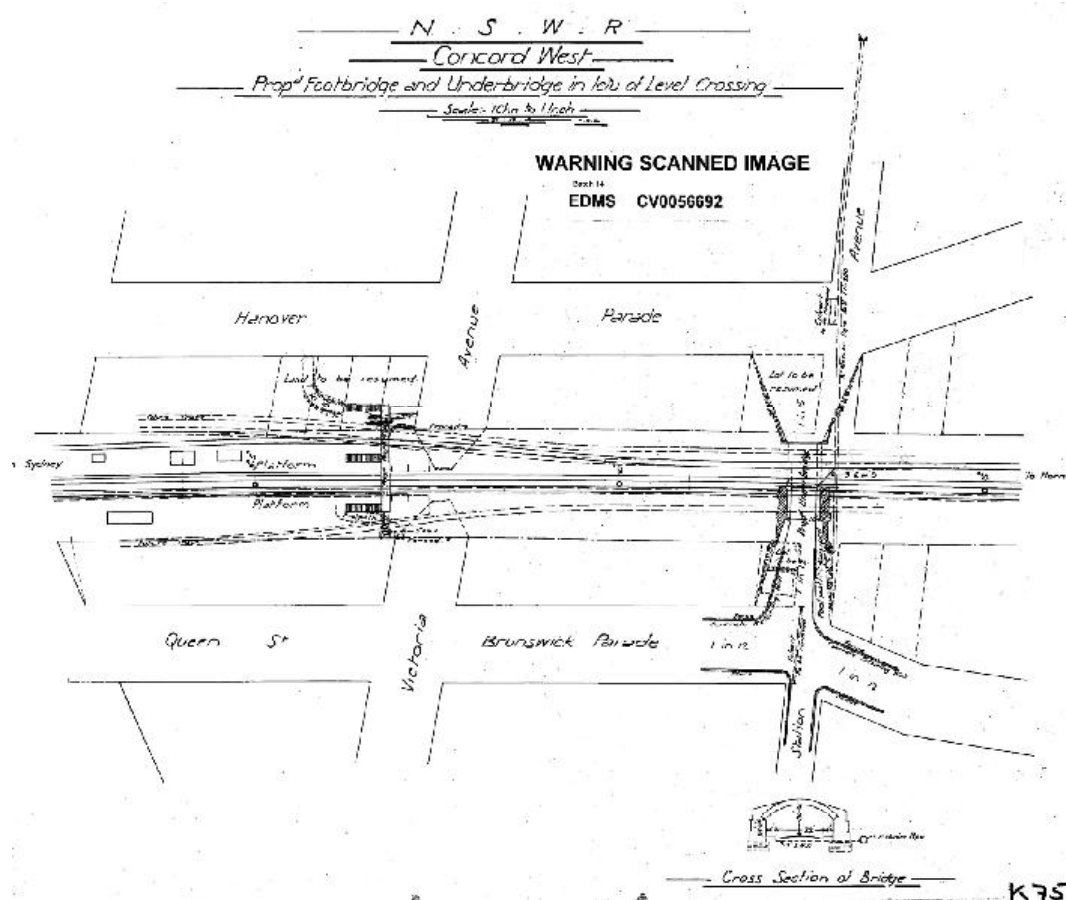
Schematic plan of proposed Footbridge and Underbridge in lieu of Level Crossing at Concord West, 1914. (RailCorp Plan, Ref: 0056692)
